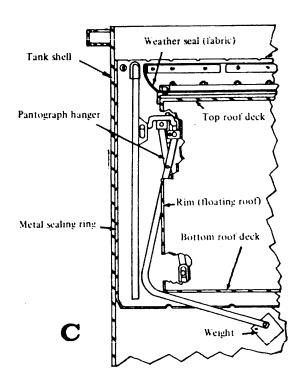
Typical Seals Used With Floating Roof Storage Tanks.
